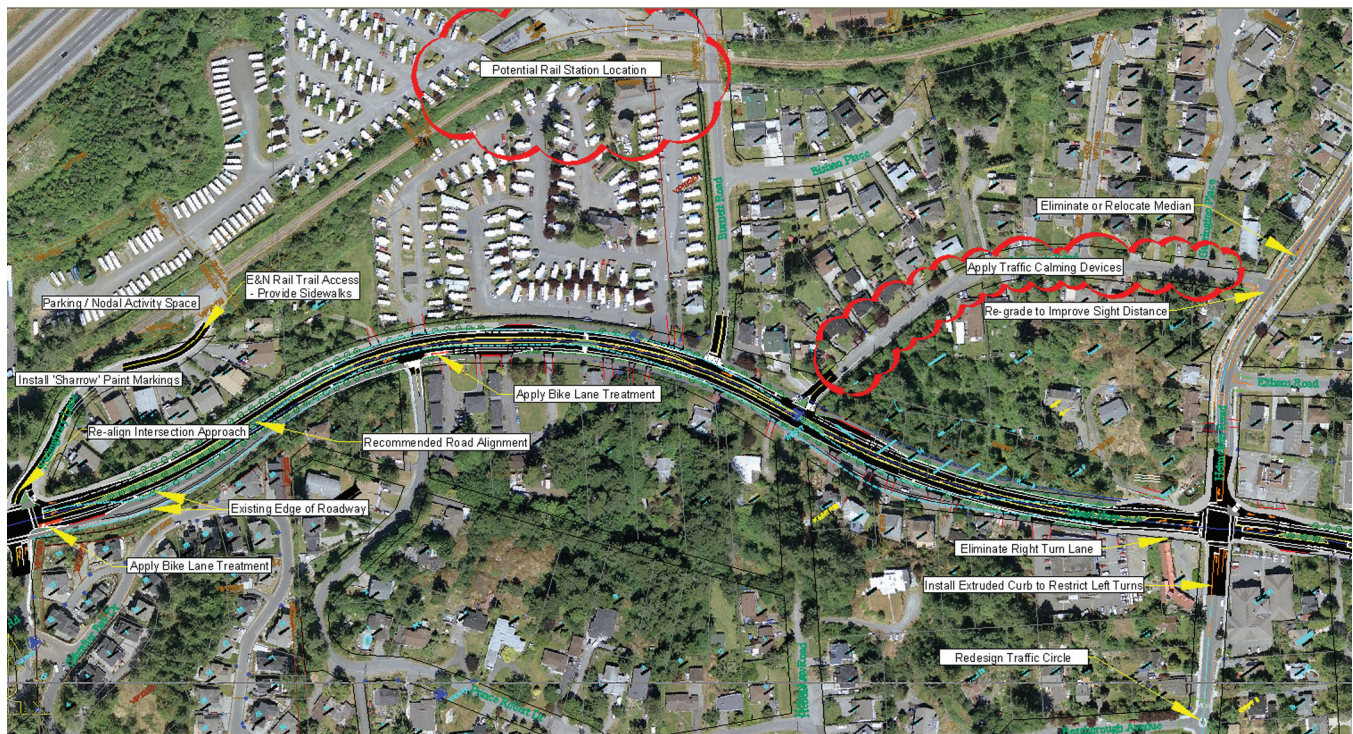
Island Highway from Kislingbury Lane / Knollwood Road to Helmcken Road
